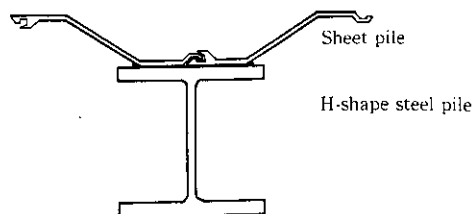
Original plan "combined section pile" (changed to alternative plan)
